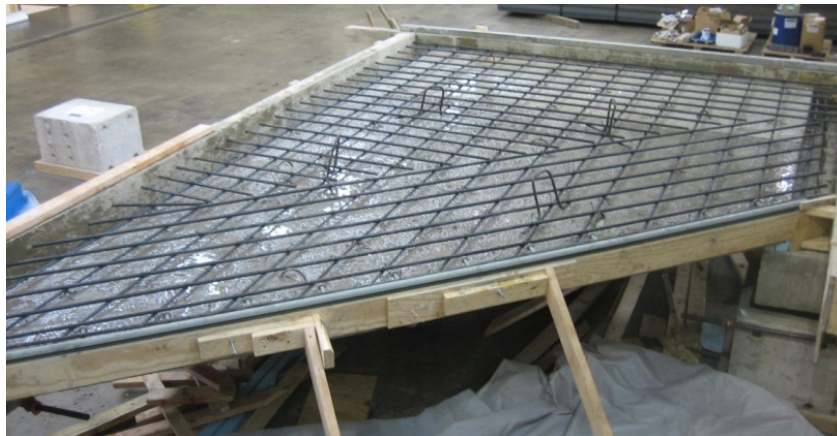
Expansion Joint and Reinforcement in Cast-in-Place Slab
